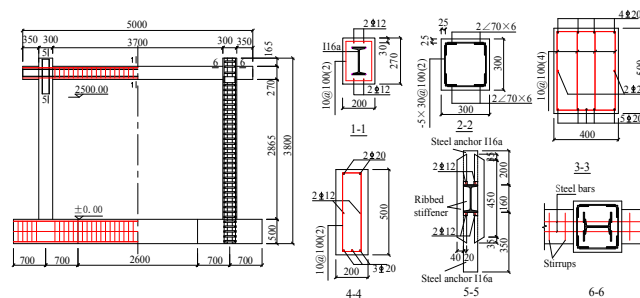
REINFORCEMENTS OF TWO SPECIMENS (UNITS: MM)
